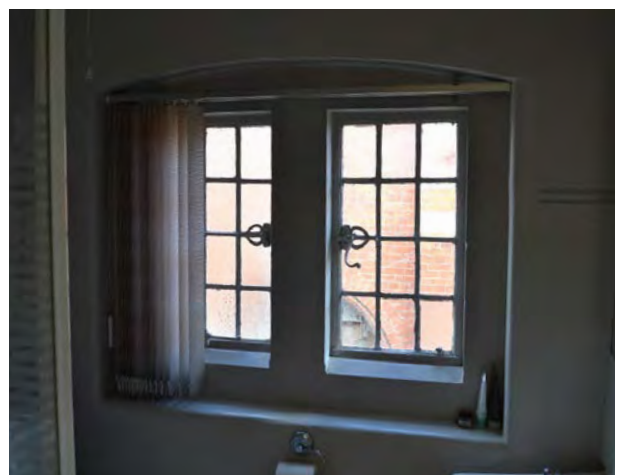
Original steel casement window in current bathroom of laundry superintendent's house.
